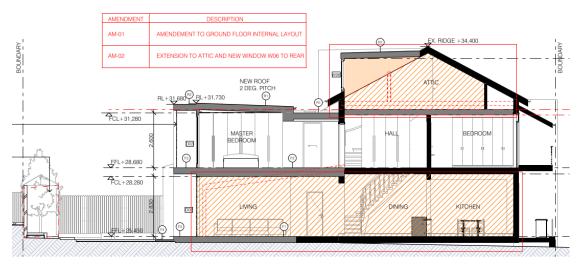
Proposed Section showing removal of first floor ceiling at 30 Church Street.
